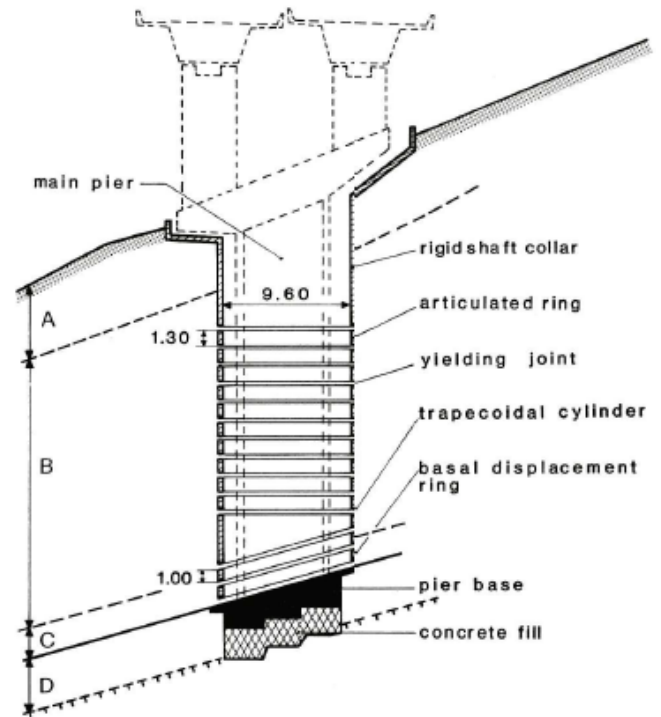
Typical Section of the Main Pier and the Shaft (Vollenweider, 1984)
